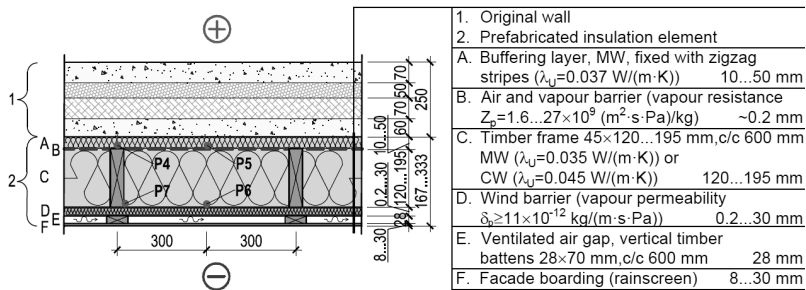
Horizontal cross-section of the original concrete wall with installed prefabricated timber frame insulation element and analysed critical points.
